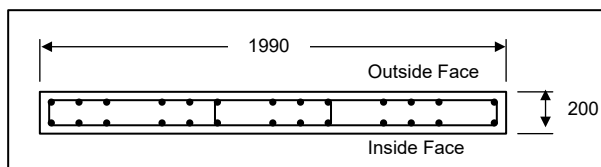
Arch section. Reinforcement at mid-section (Sect. A).
